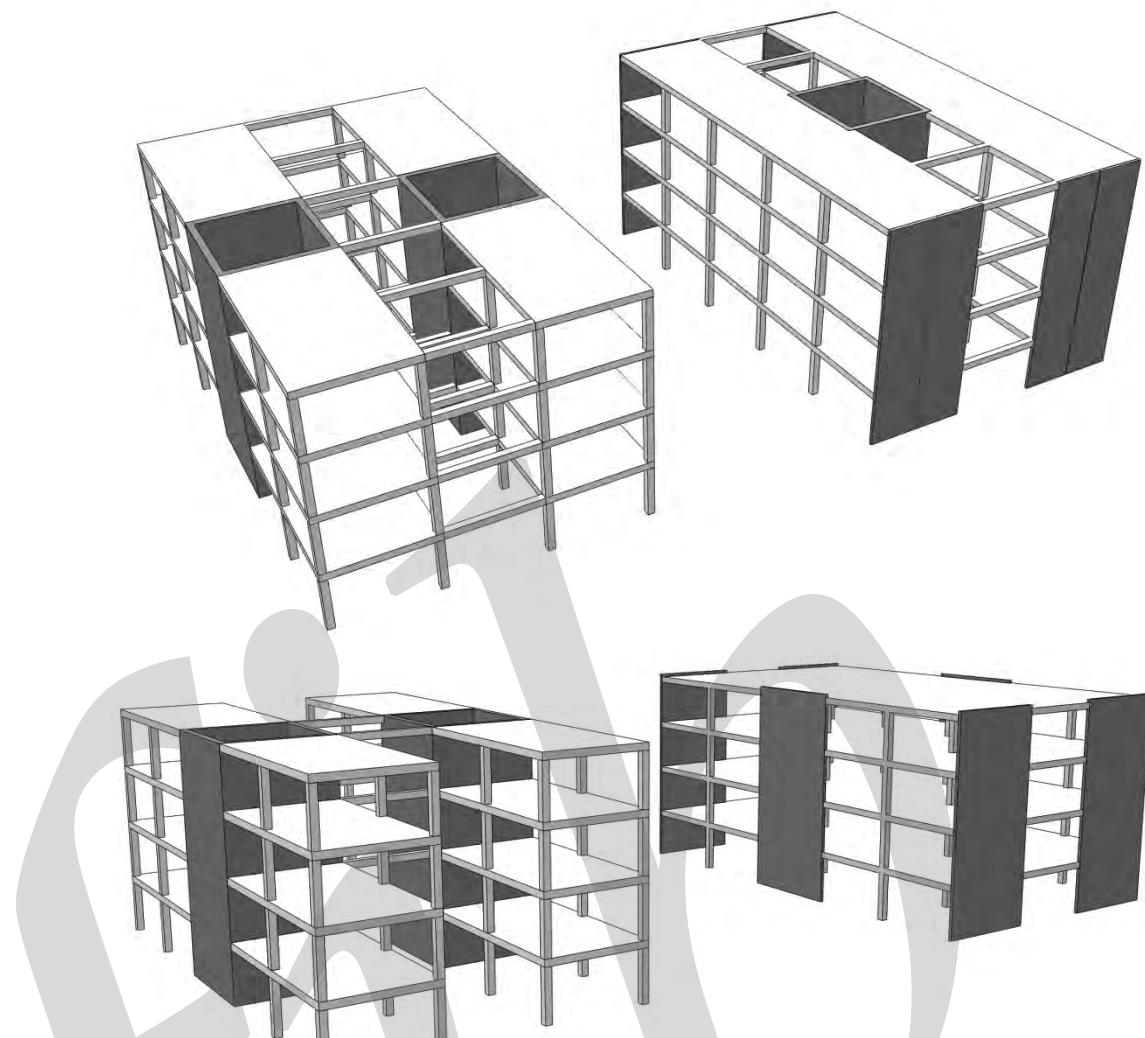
Building examples of the symmetrical distribution in plan of the lateral stiffness and mass [37]
